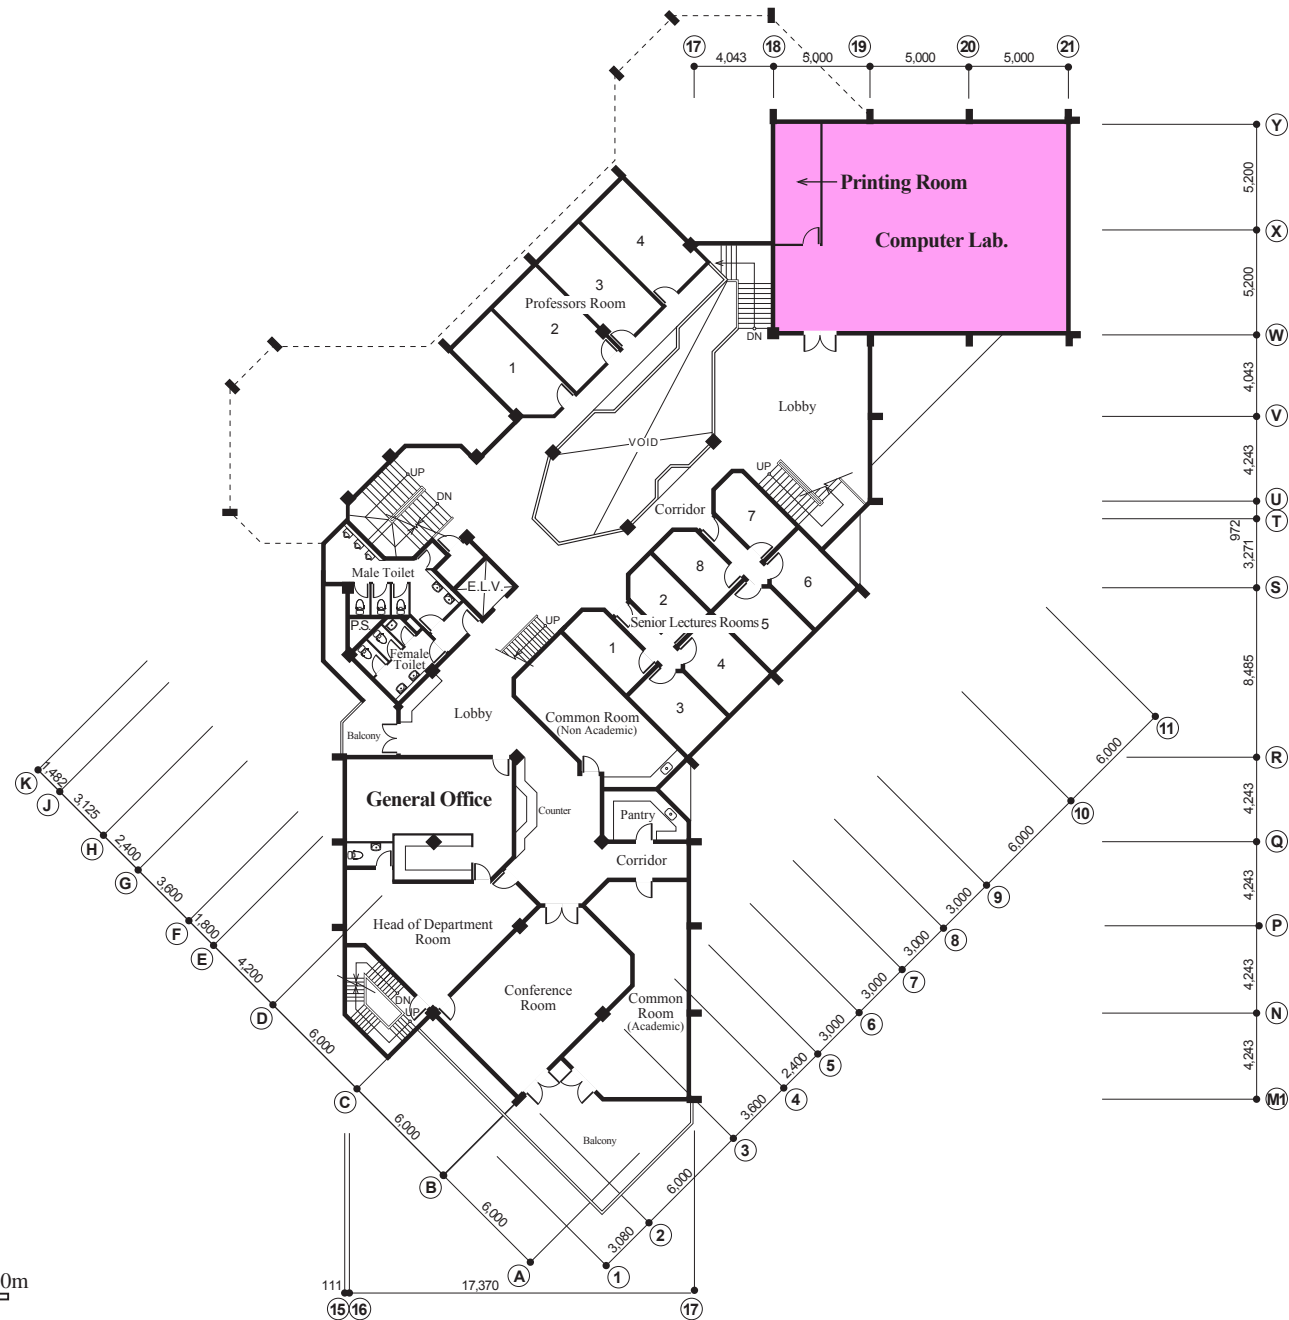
First Floor Plan of New Building for Department of Electronics & Telecommunication Engineering
